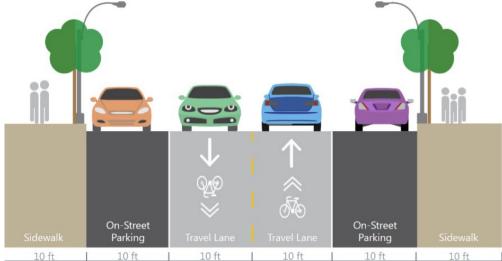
TYPICAL SECTIONS OF PLANNED ROADWAYS (COMPLETE STREETS PLAN)
